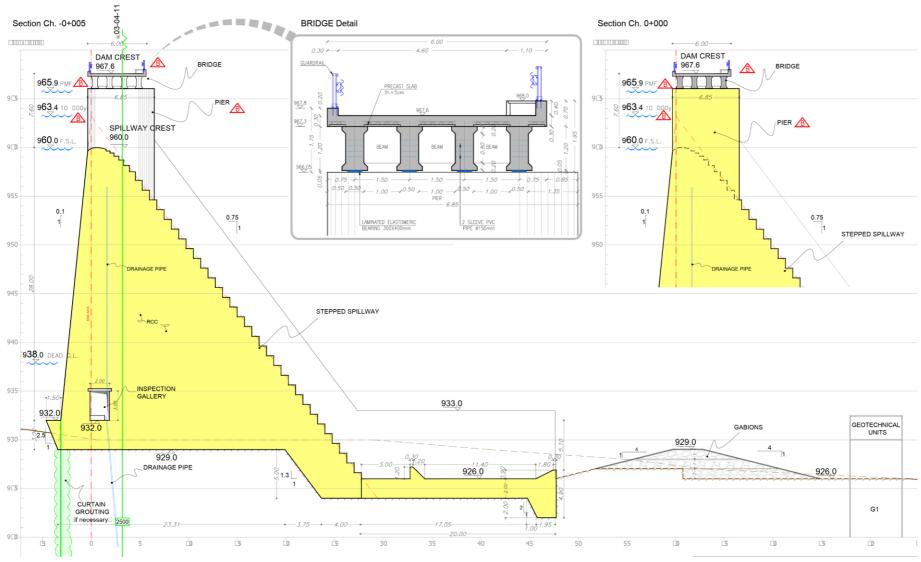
Cross-section of the Spillway (Studio Pietrangeli, 2019)
